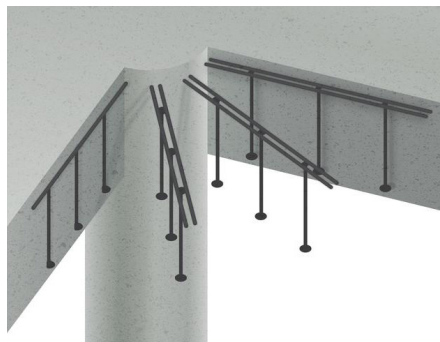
proprietary flat slab shear reinforcement (main slab reinforcement not shown)
